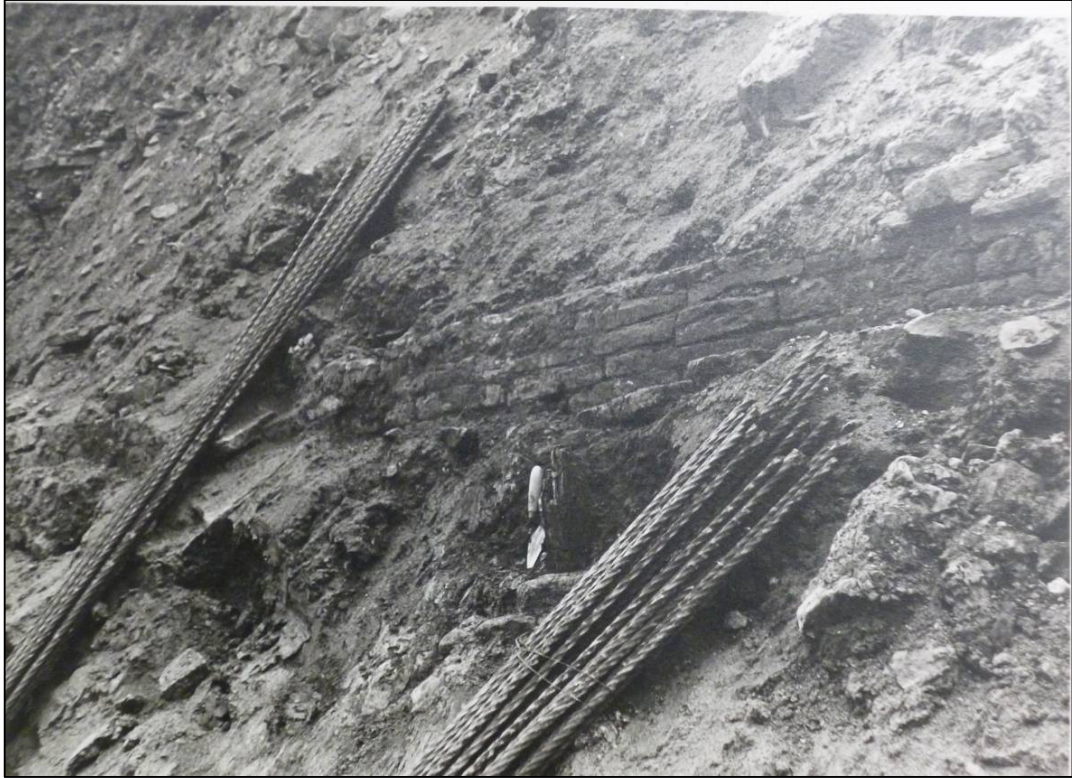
Revetment wall in steep north-facing slope to Castlegate, photographed by Pauline Beswick, May 1972 (MSA Box file - Sheffield Castle Project File) (photo 3/888).
